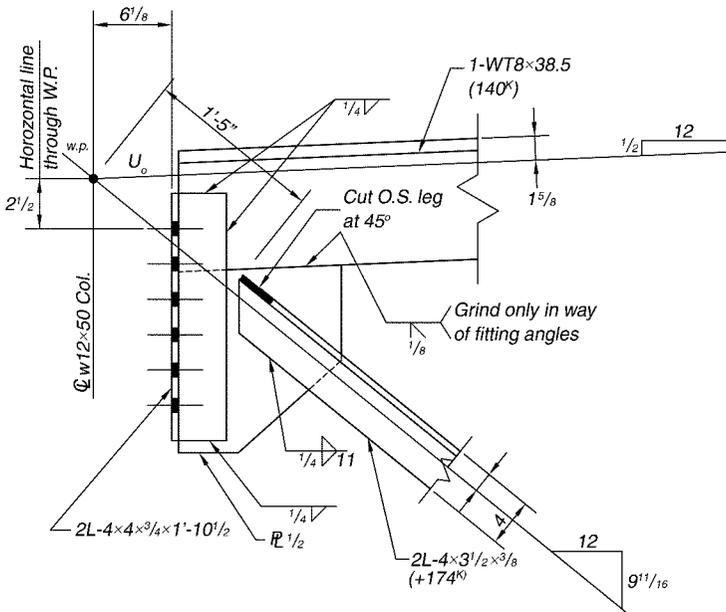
Truss-support connection, working point (w.p.) at column centerline.
